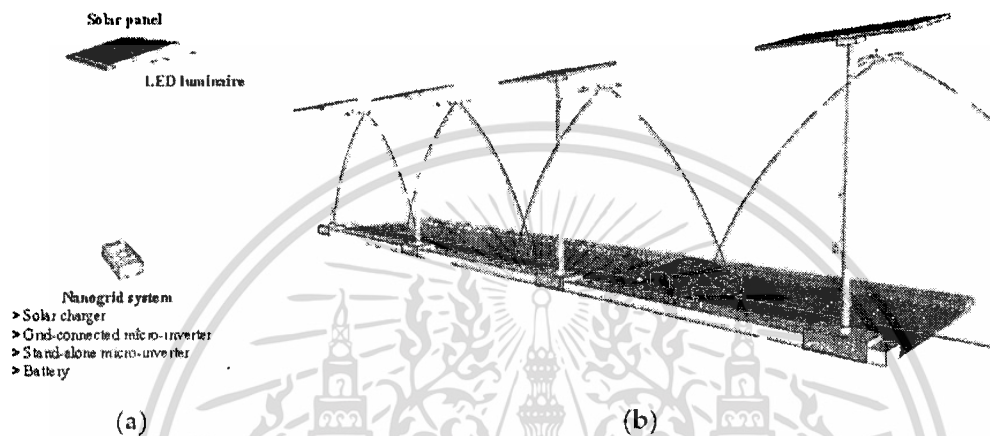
The road lighting system: (a) Element of the road lighting pole; (b) The road lighting system.
